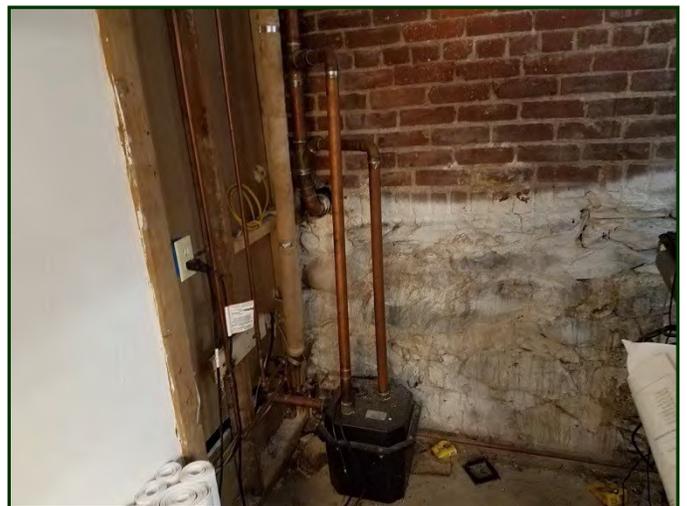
Sink pump ejector system serving sink in adjacent breakroom
